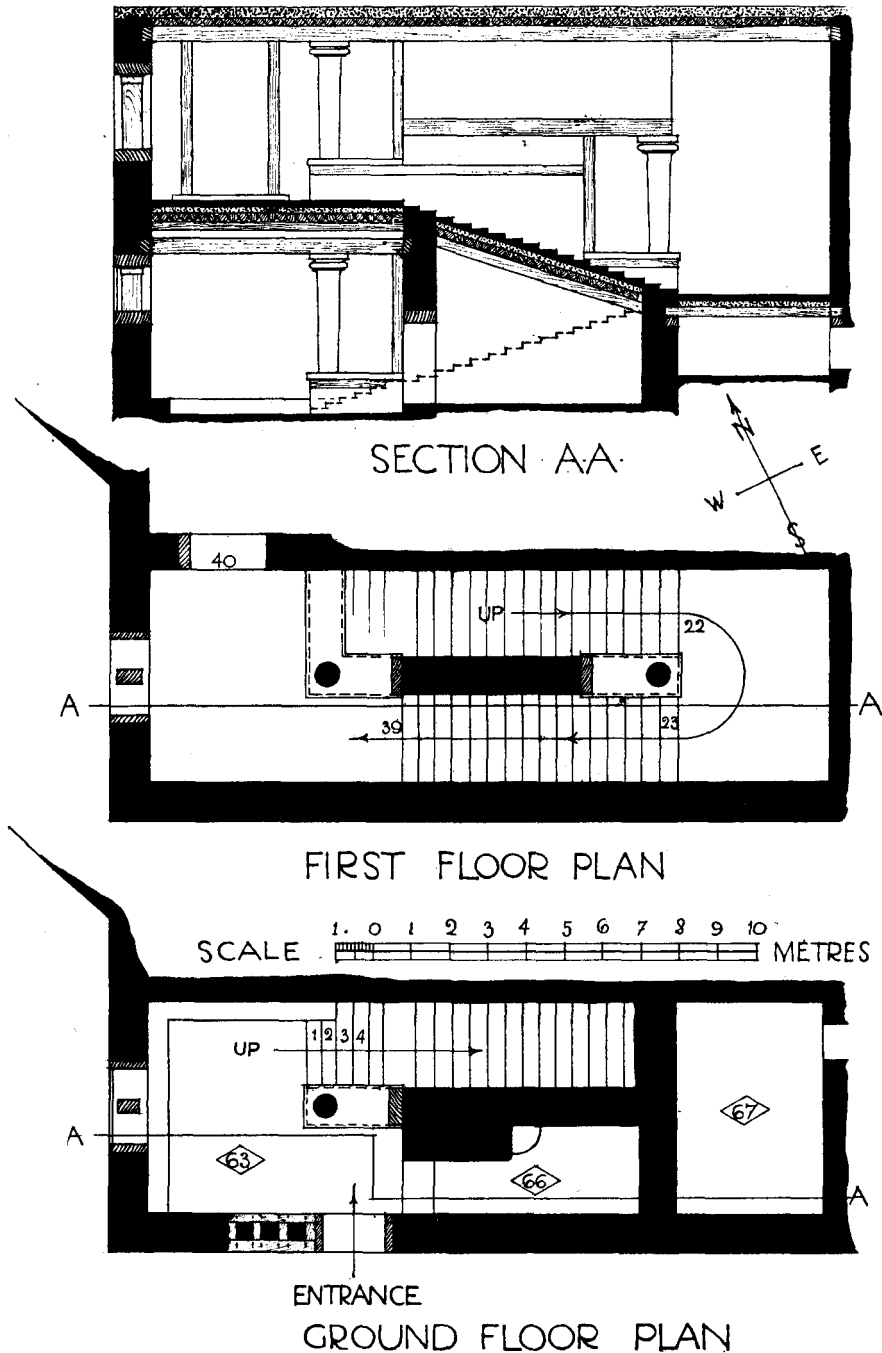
GRAND STAIRCASE, RESTORED. PLANS AND SECTION.
